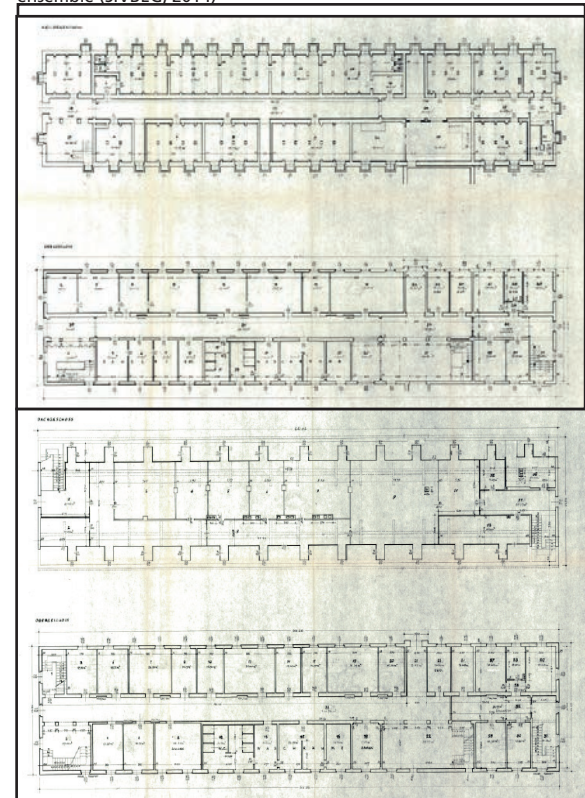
Ground plan for object 5 (SIVBEG, 2014)
